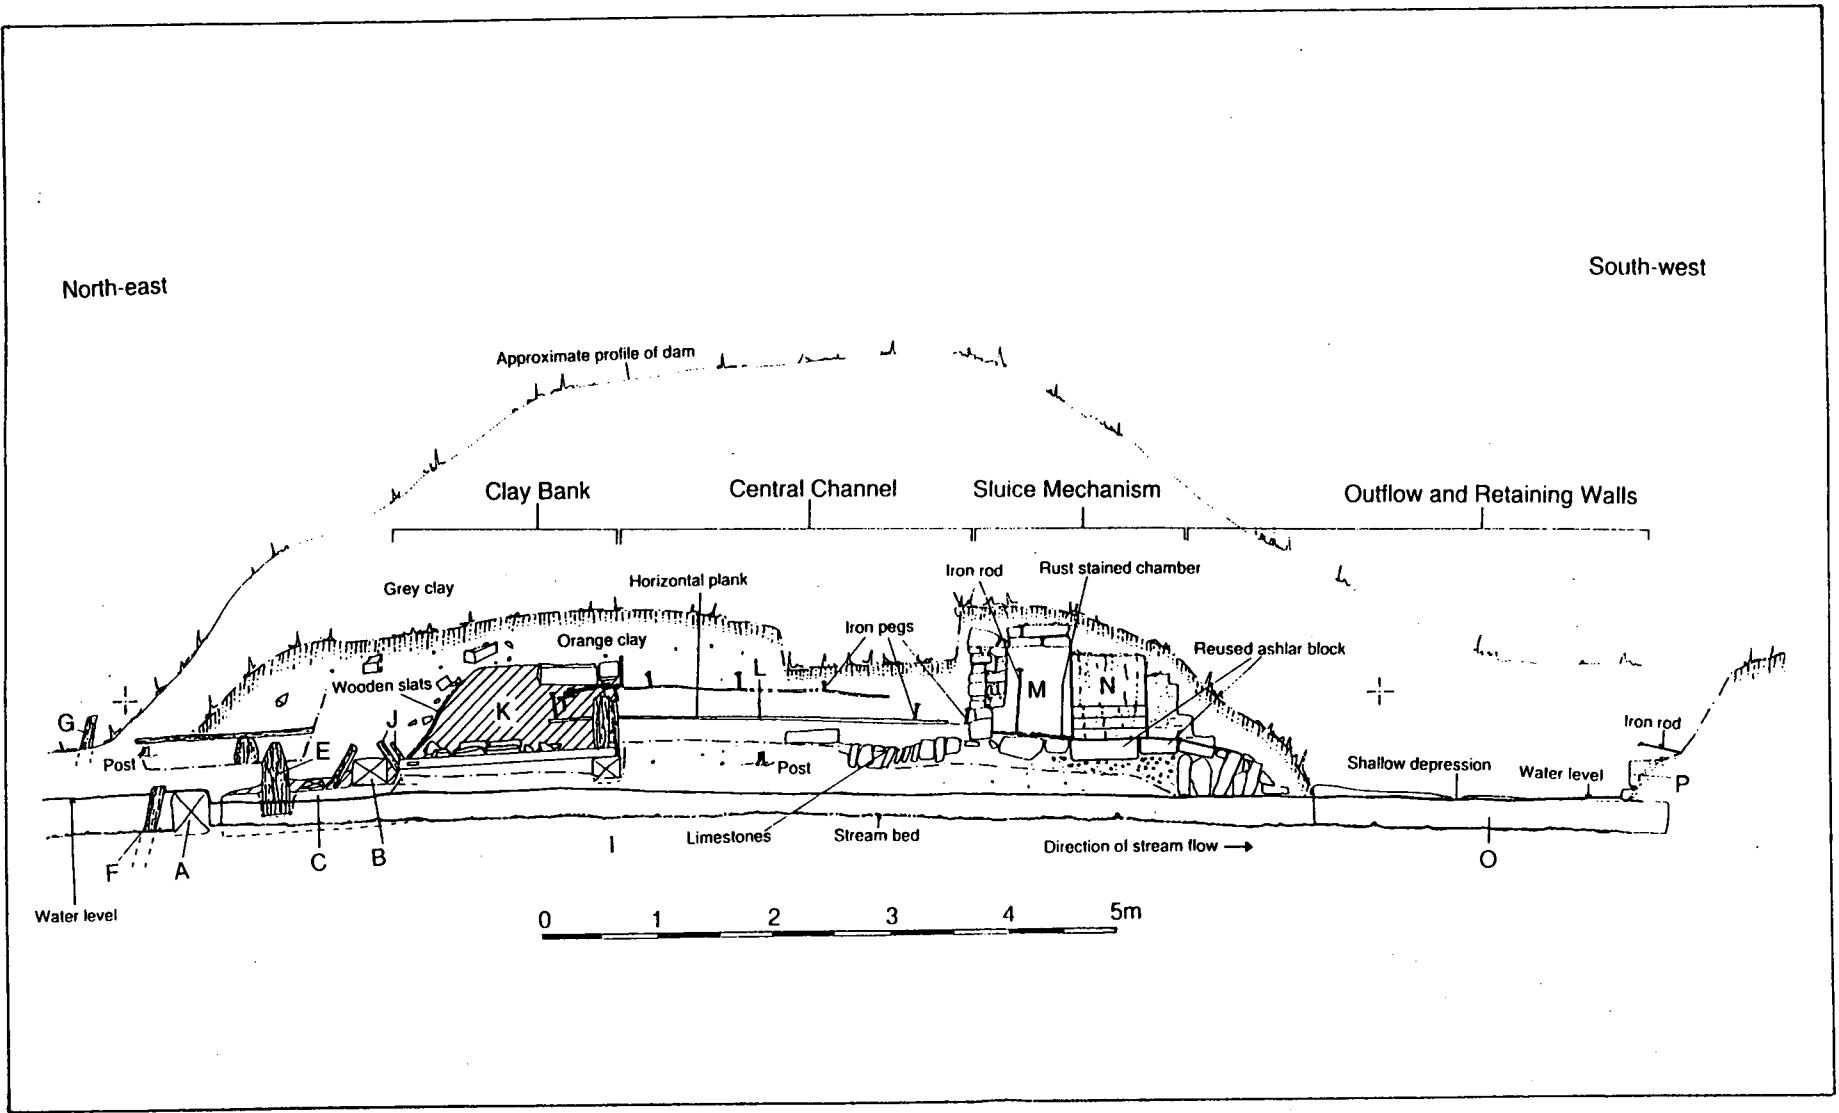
Slowe Gardens. Section through the construction of the Haymanger Pond Dam.
